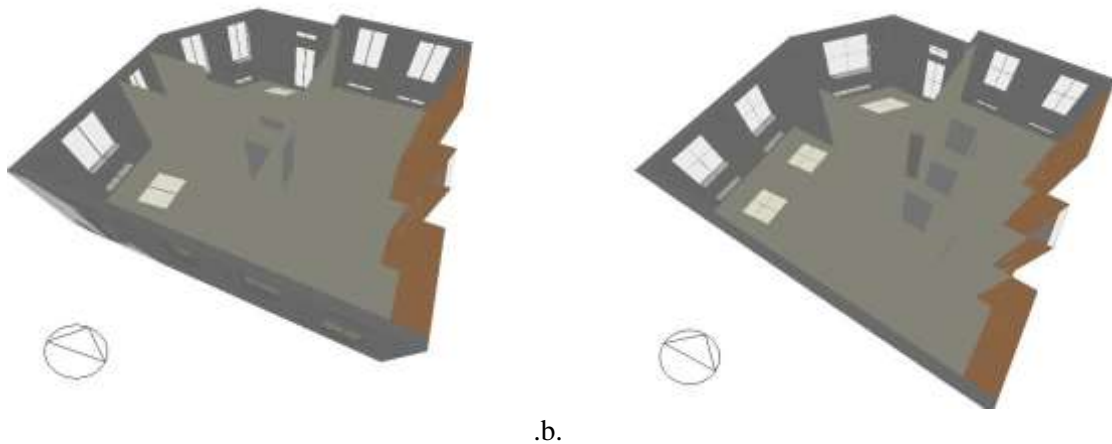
new apartment optimizing design a. cross ventilation, b. single side stack ventilation.
